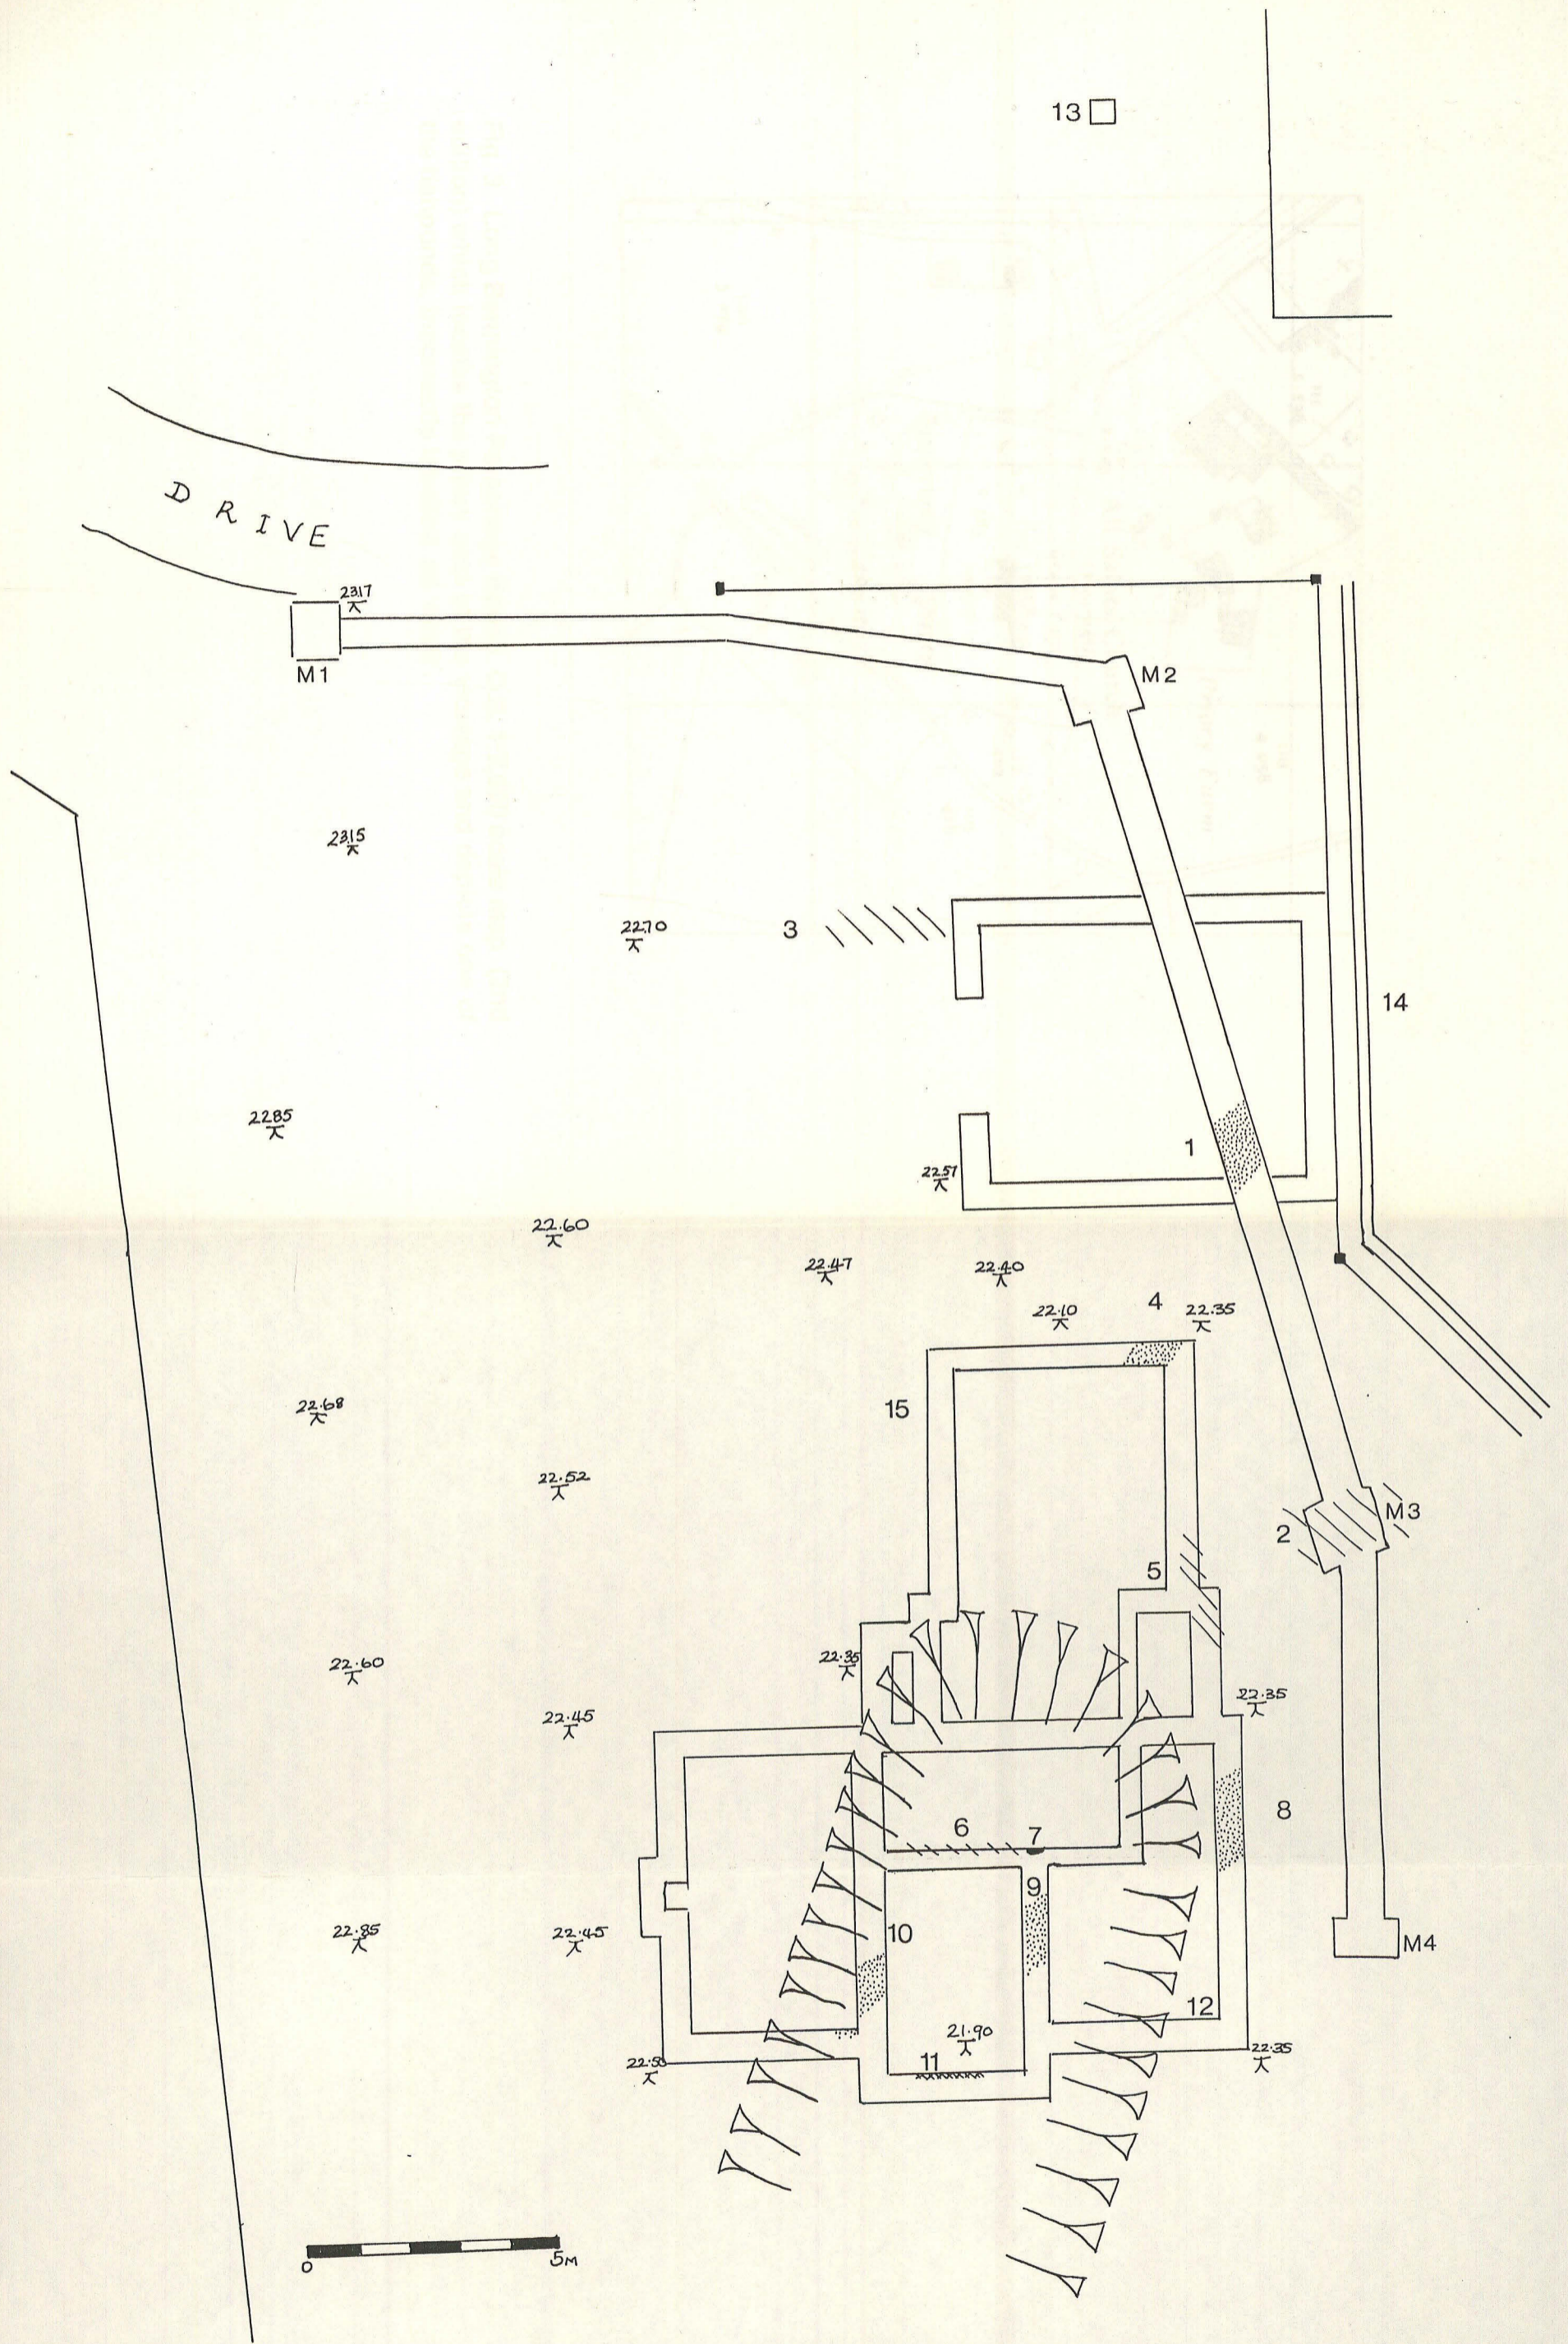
Long Bennington Parsonage House site plan showing building layout and position of archaeological observations. Based upon Drawing AL1 prepared by Stuart Long Architect.
